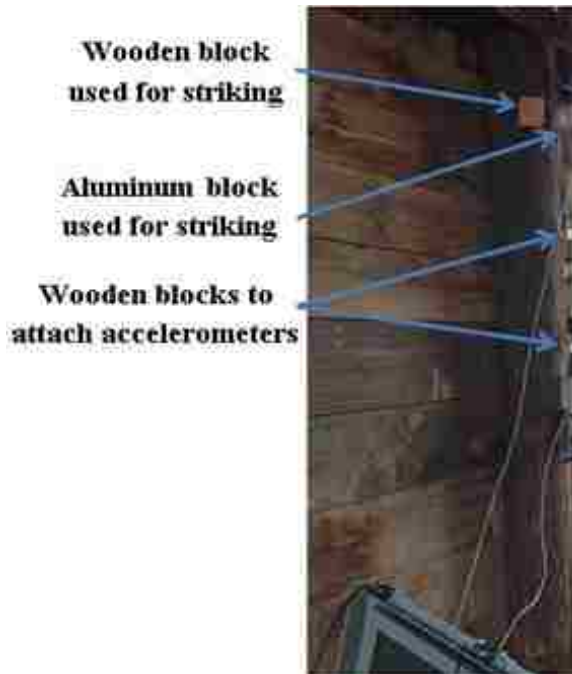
Typical SE Test Setup for Piles of Bridge No. 6922
